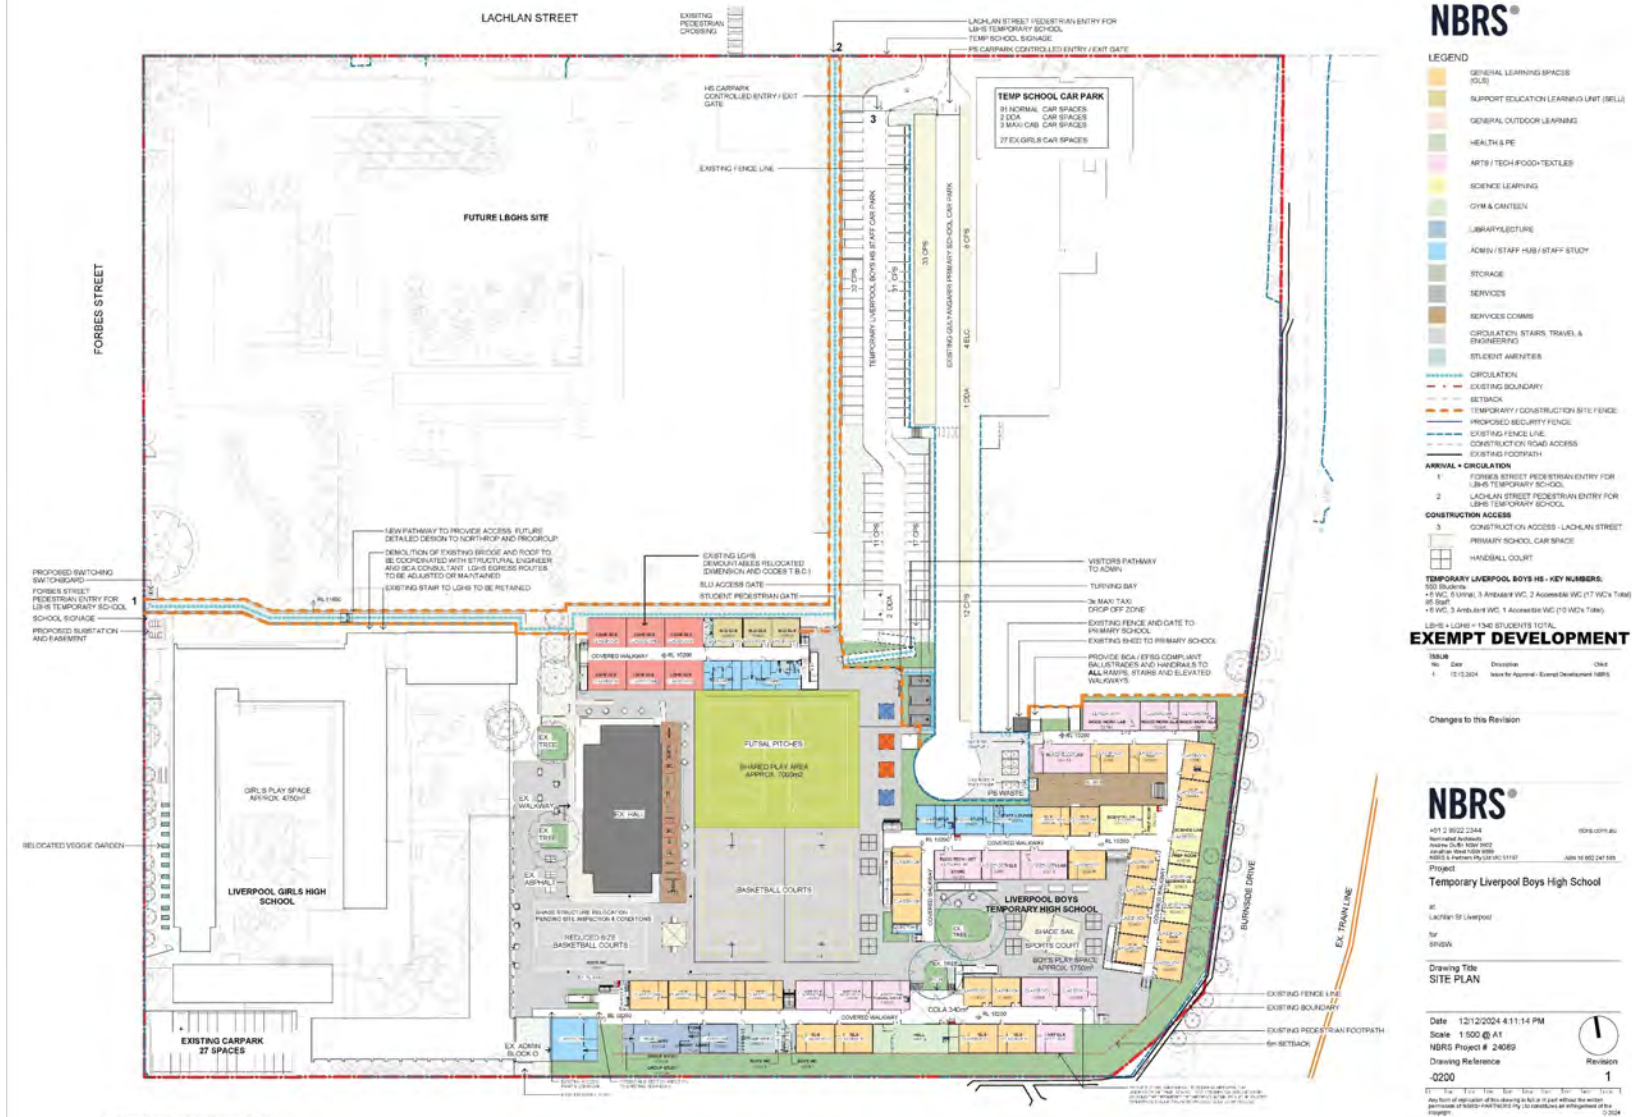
Temporary site plan (Source: NBRF February 2025).
